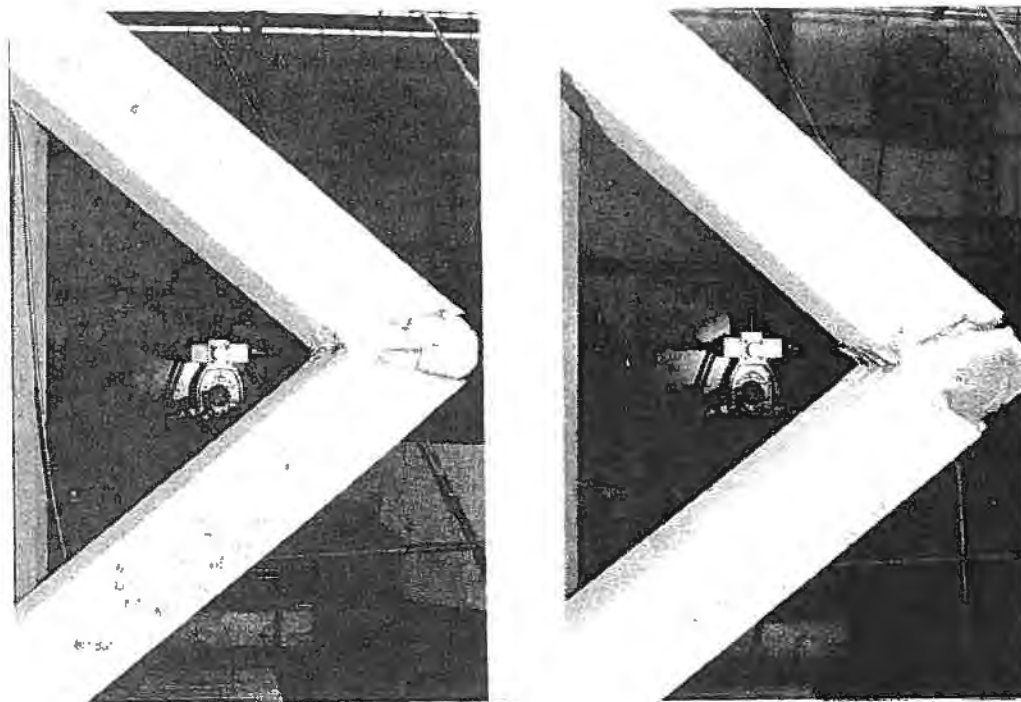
Specimens with high reinforcement ratio at maximum deformation. The specimen to the left has conventional reinforcement and the specimen to the right has the new detailing.
